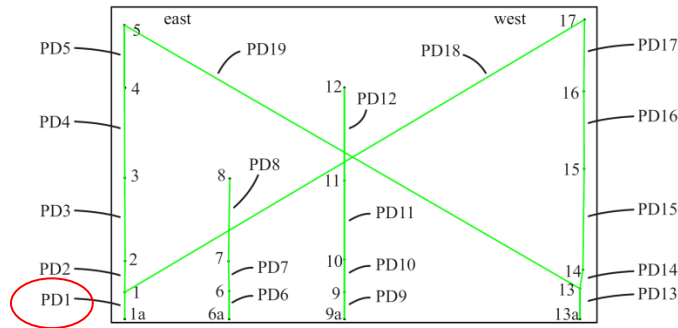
Instrumentation at base wall panel of specimen TW1 (from Perez et al. 2004)
